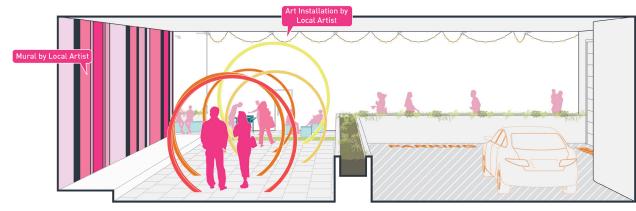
Laneway 4 Design; Section 4b, perspective section
